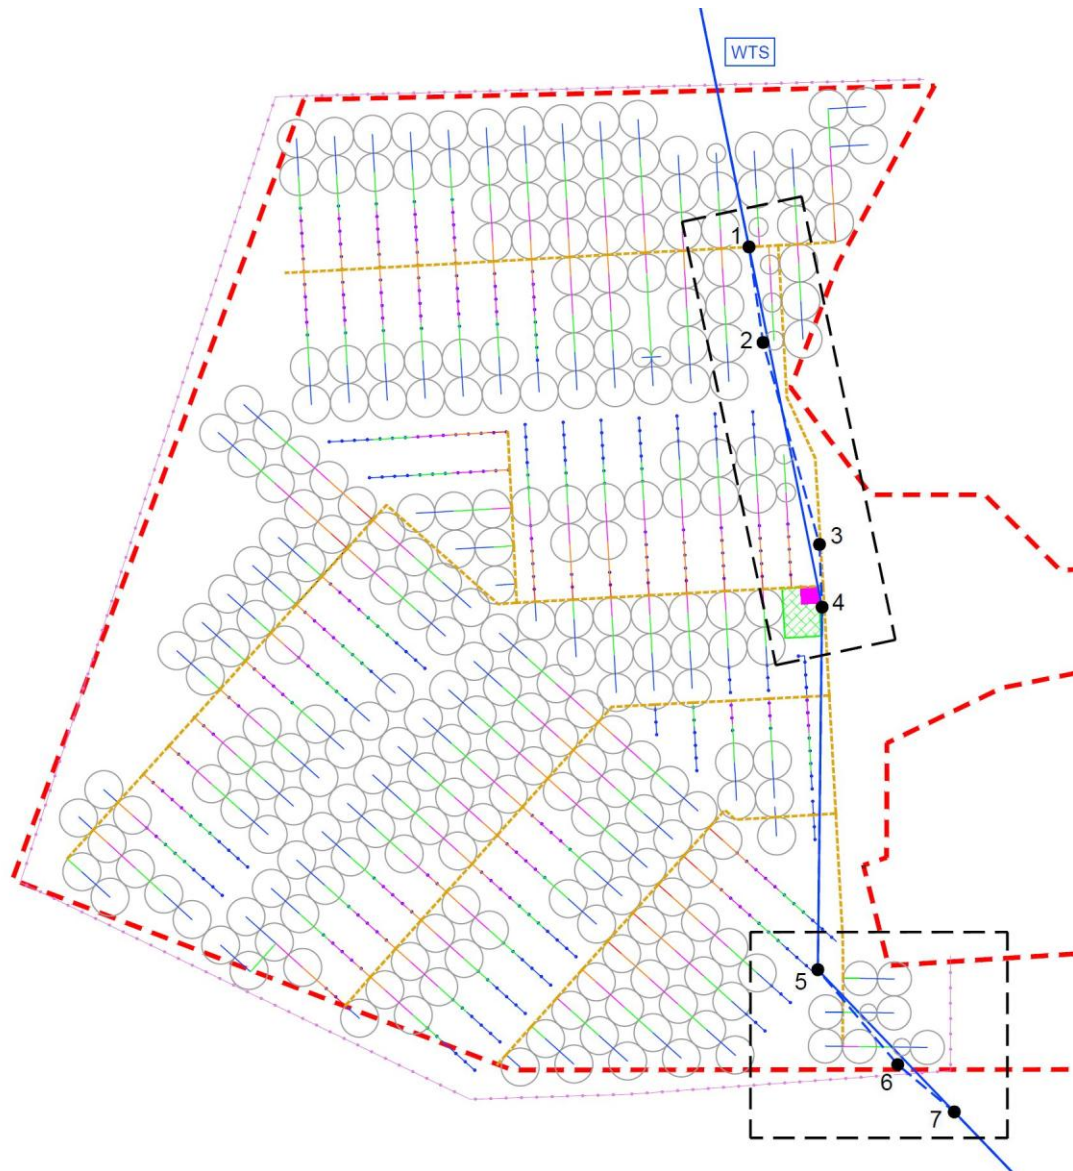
Proposed alignment of center pivots, secondary pipes and WTS
